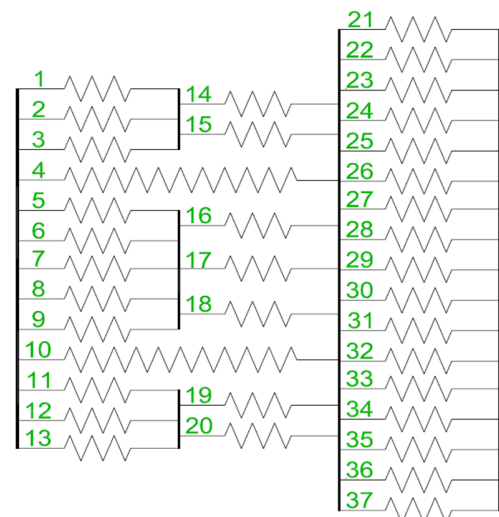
Assemblage of Masonry Piers of First Storey Wall in the Initial Situation
